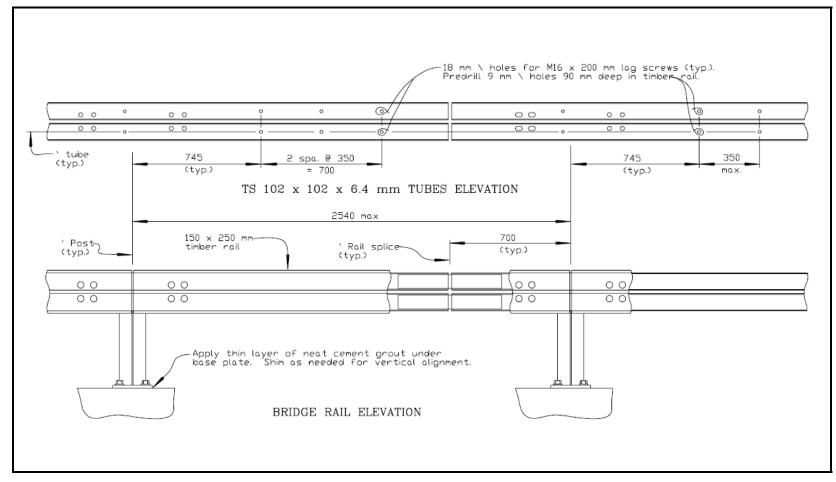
Layout of Tubular Steel-Backed Timber Bridge Rail
